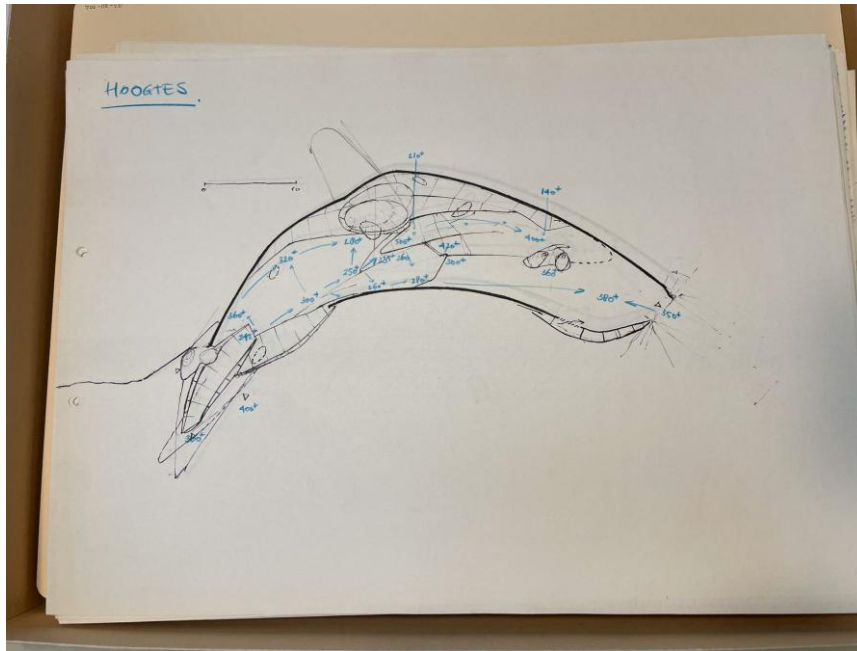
Heights annotation diagram ("Hoogtes"), Water Pavilion (freshH2Oexpo), 1993. Hand-drawn in blue pencil on plan base. API73 collection. Ground level elevations are recorded at each significant position along the building, ranging from approximately 140 cm to 400 cm above datum. The diagram coordinates the variable floor level with the structural section series.
